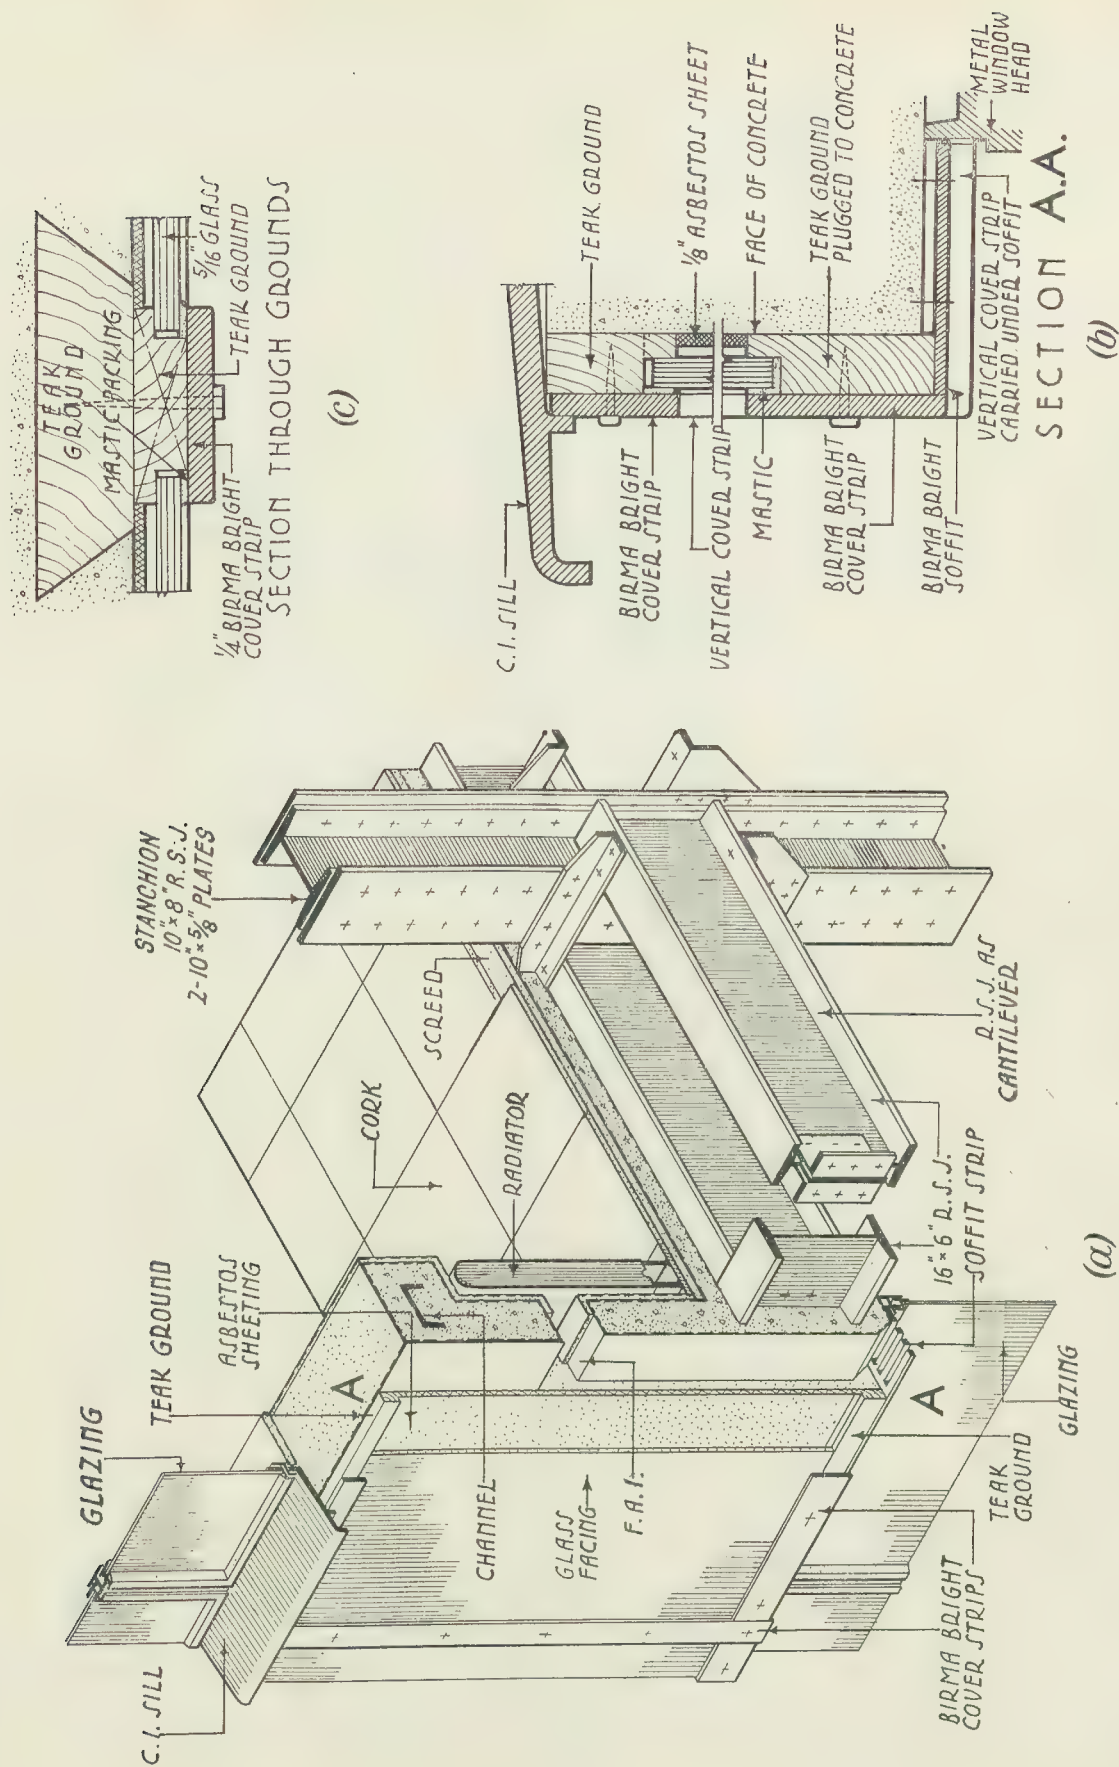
CONSTRUCTION OF GLASS-FACED EXTERNAL WALL SUPPORTED UPON CANTILEVERS
